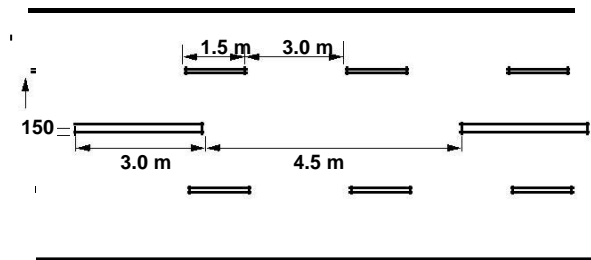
10: Traffic lane marking for a four lane road with broken centre line
